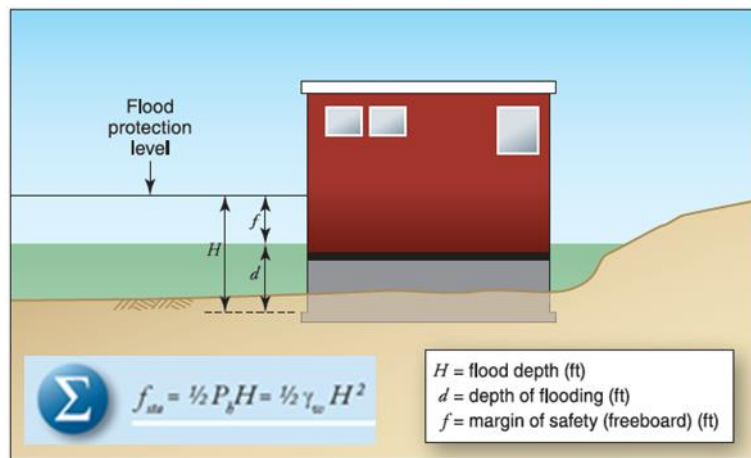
Schematic of hydrostatic loading on buildings and building components. Source: FEMA (2012, 2013).
